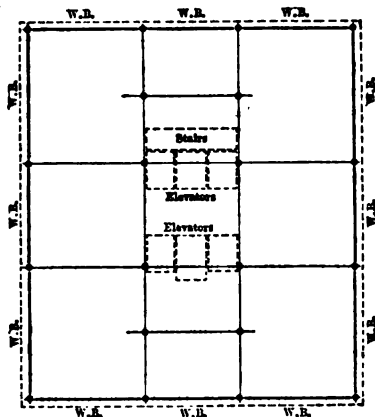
Metropolitan Tower. Plan and Lines of Bracing
